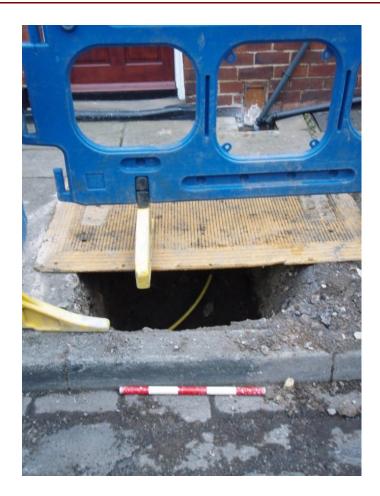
Trench 22 facing south-east, scale unit 0.1m.
